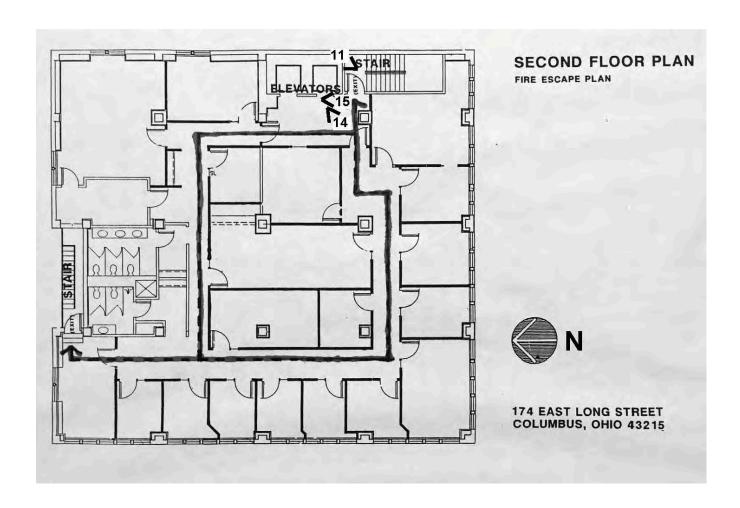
The Standard Building Floor Plan/Photo Key – Second Floor
